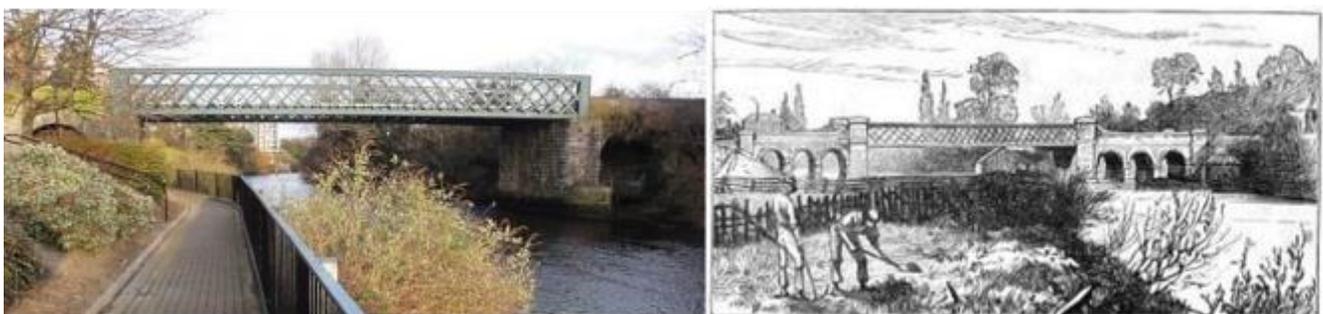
Liffey Rail Bridge. View from West and historic view
